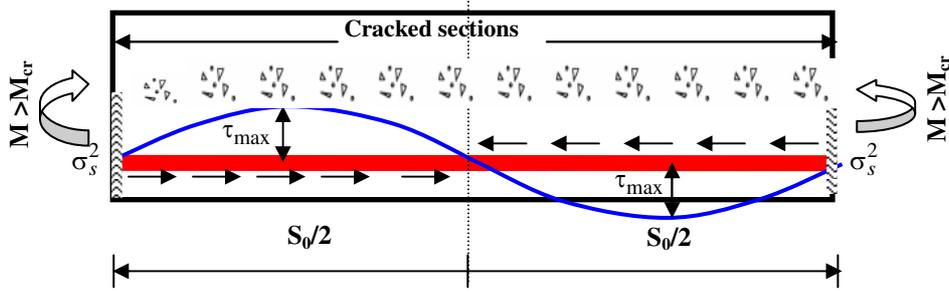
Bond stress between adjacent cracked sections in constant moment case
